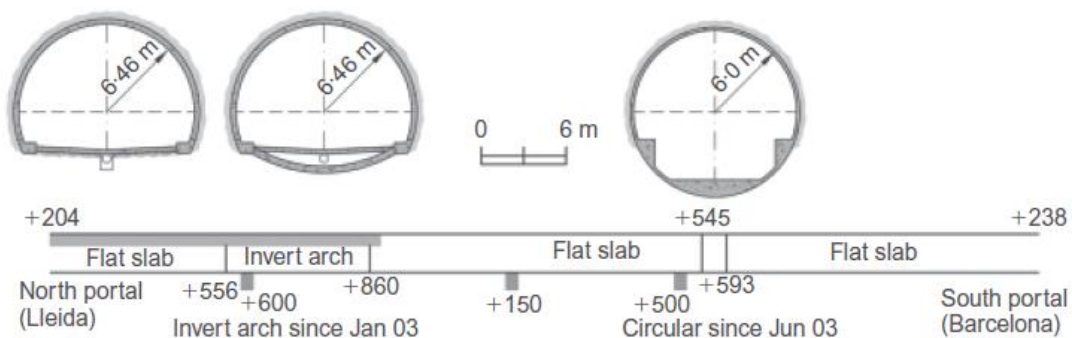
Initial cross sections and testing sections in the longitudinal section of Lilla tunnel
